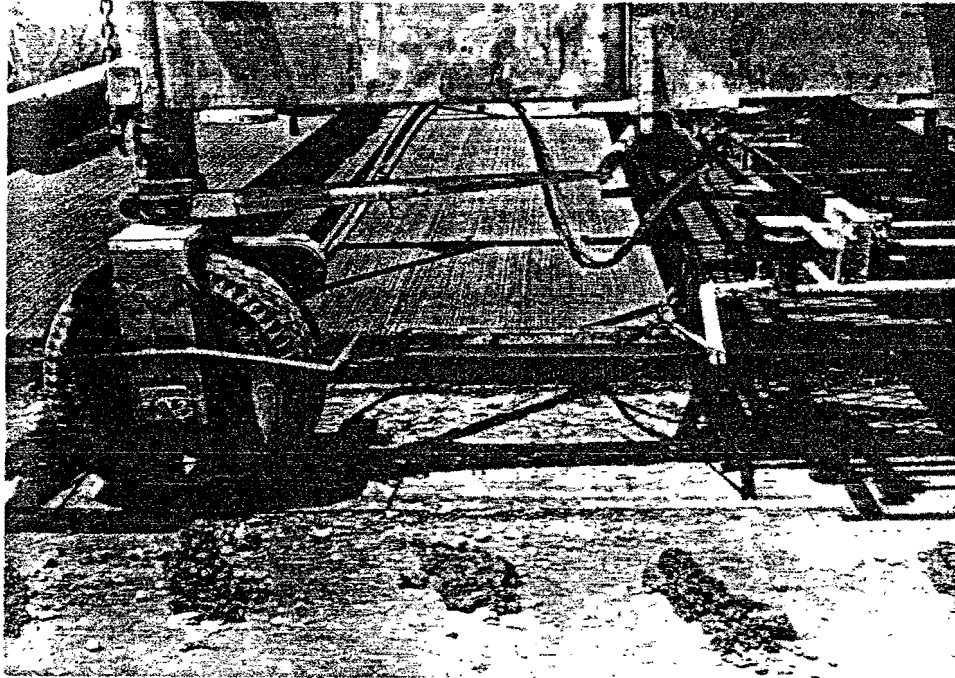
Transverse Tines Finishing Machine on IH 27, Hale Co.,
